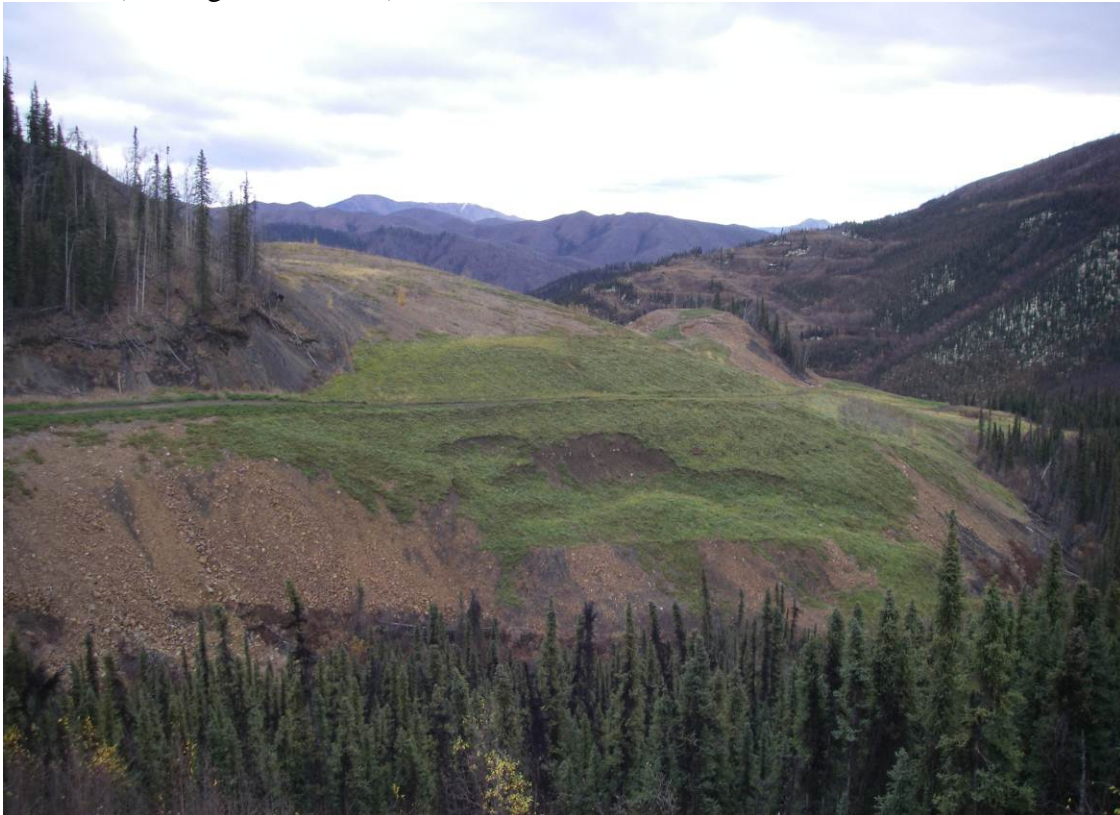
Taken from “Photo Hub #1”, view of the slope instability below the Lucky Dump haul road.
